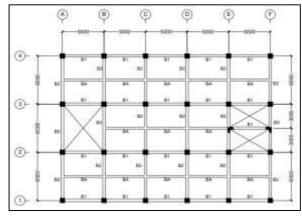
1st = 2nd = 3rd Story Beams Plan
